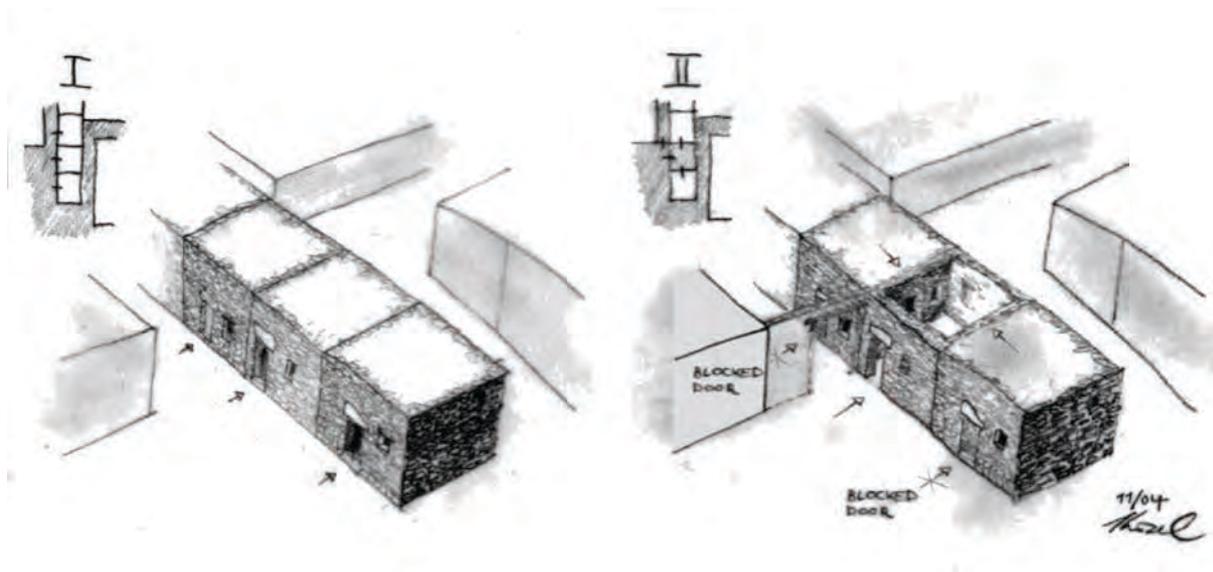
Rajif Old Village, Southern Jordan. Complex building events: modification and alteration of ground plans. Three single-roomed houses (I) were transferred in a two-roomed house with a courtyard (II).
